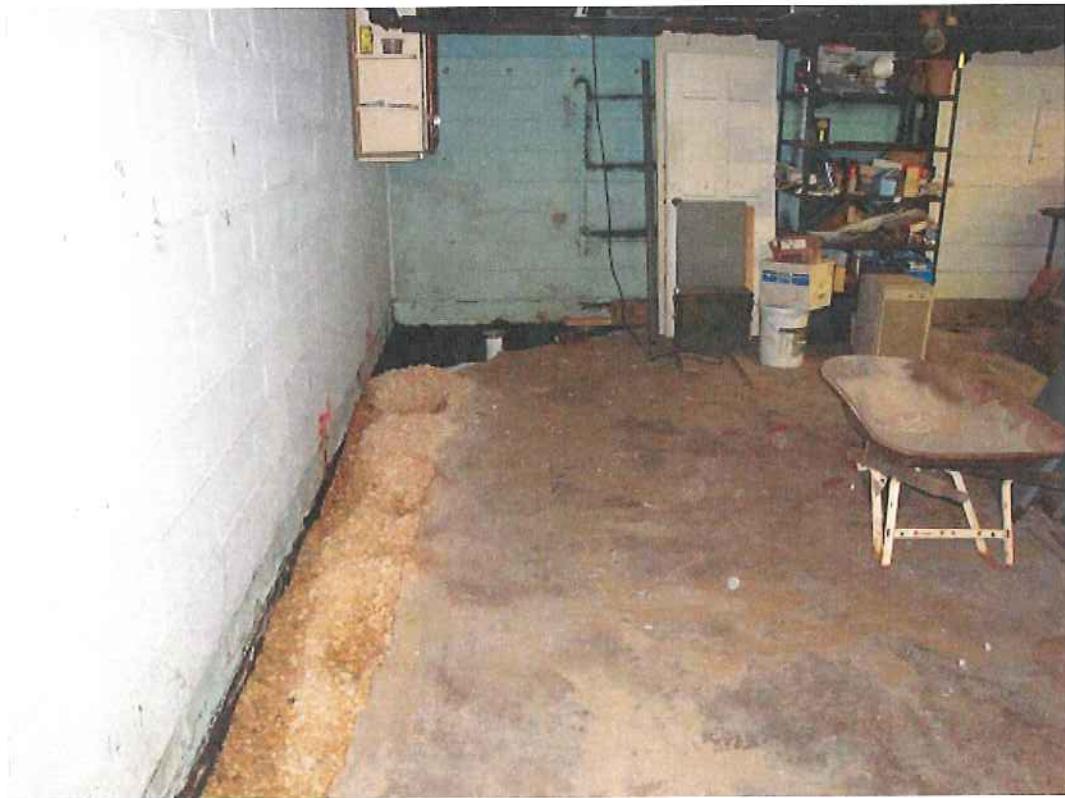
View of excavated basement floor located in 11 Hillside Road.
